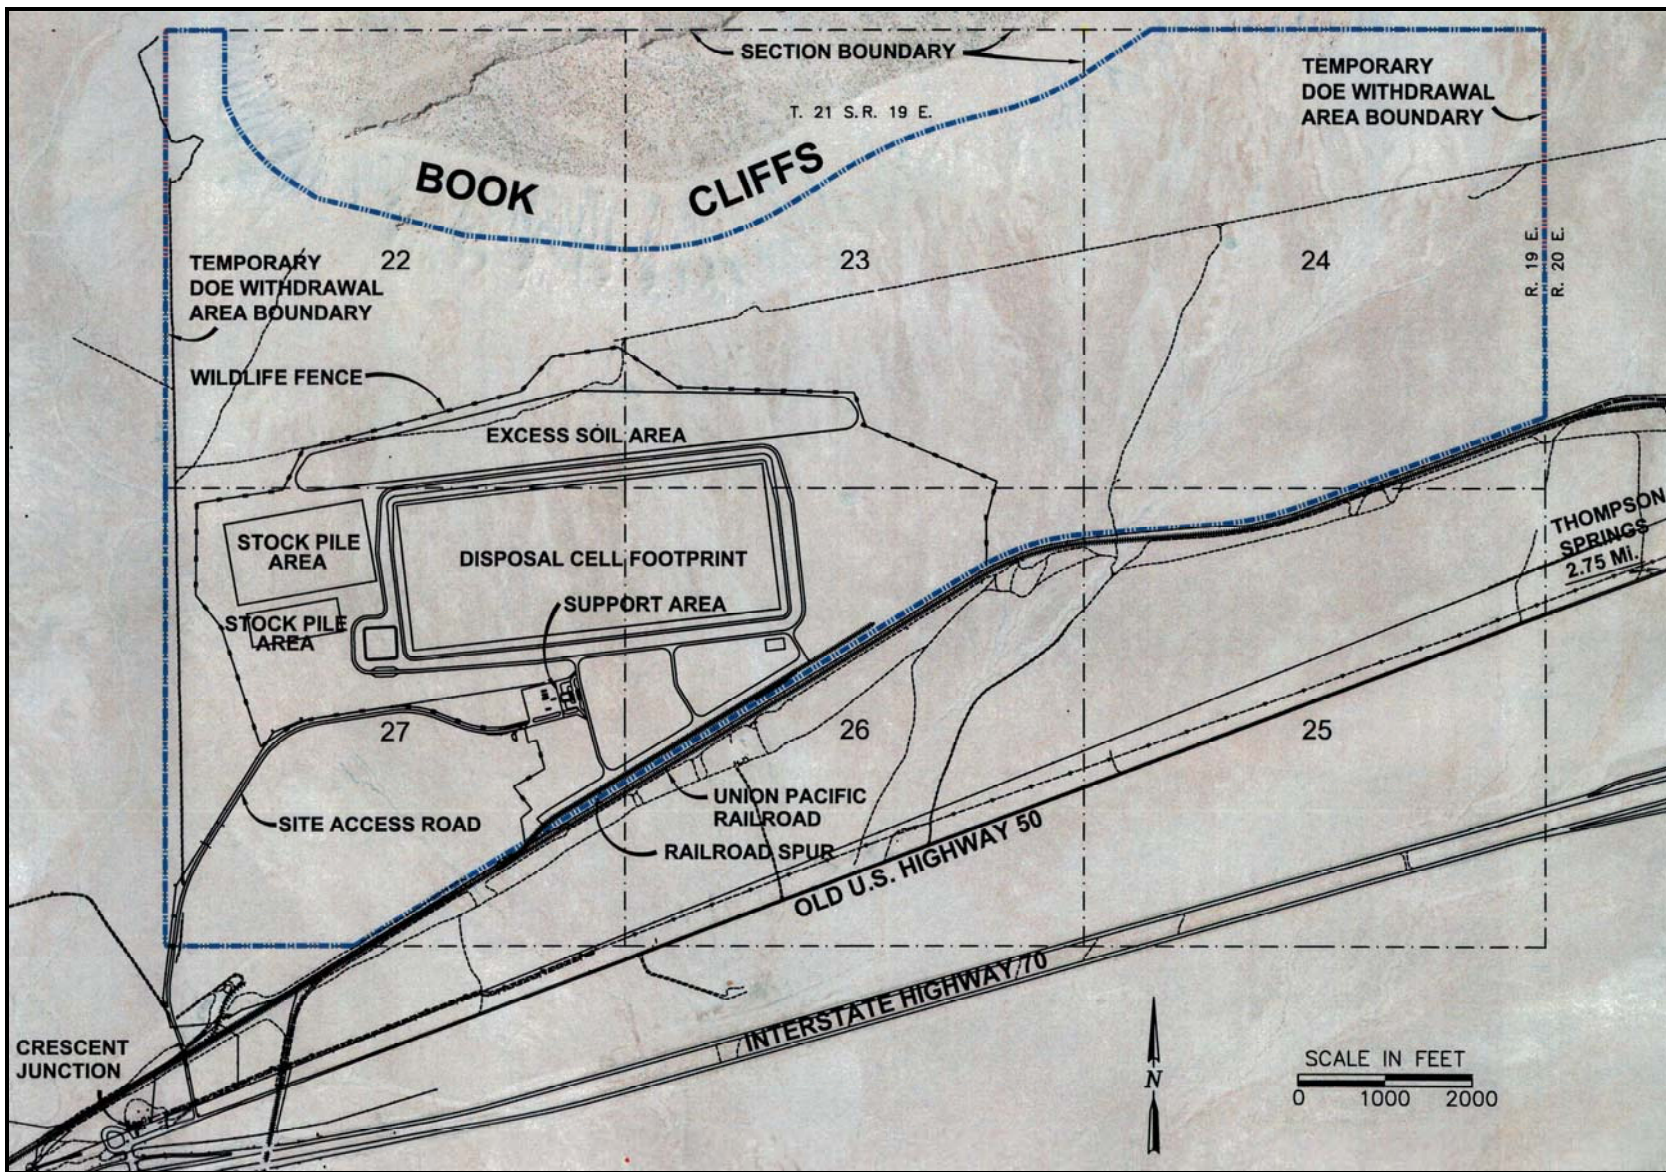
Crescent Junction Disposal Cell Footprint and Existing and Proposed Site Features
